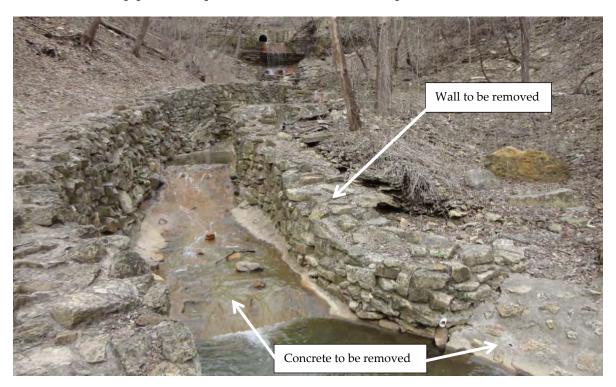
East wall and concrete lining should be removed in the upper step pool reach.
